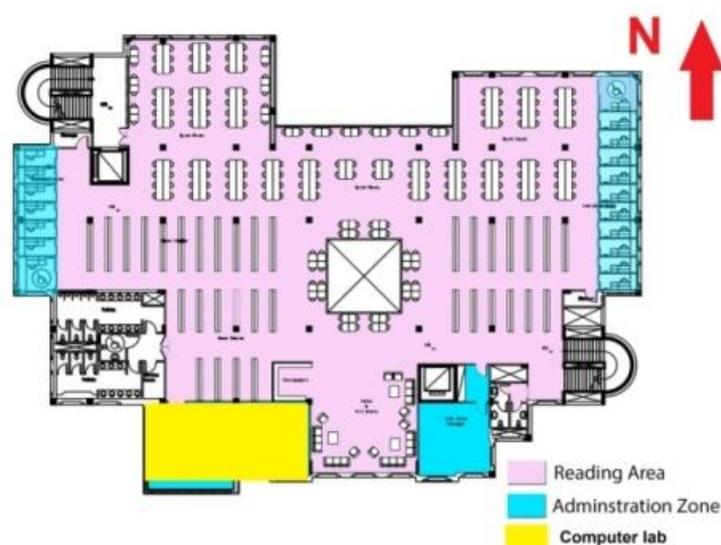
BUE library building- 1st floor plan took north orientation, source: Engineering administration.
